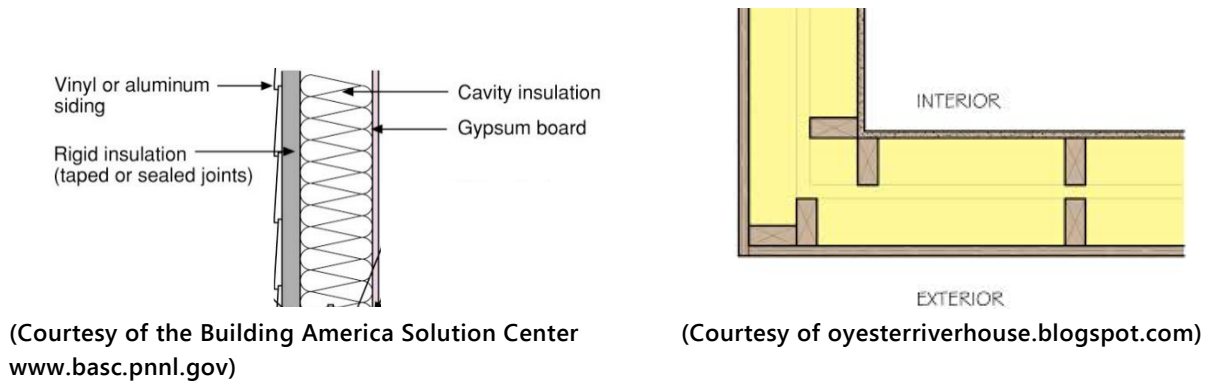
Left Image: Rigid Insulation at the Wall Exterior. Right Image: Double Stud Wall.
